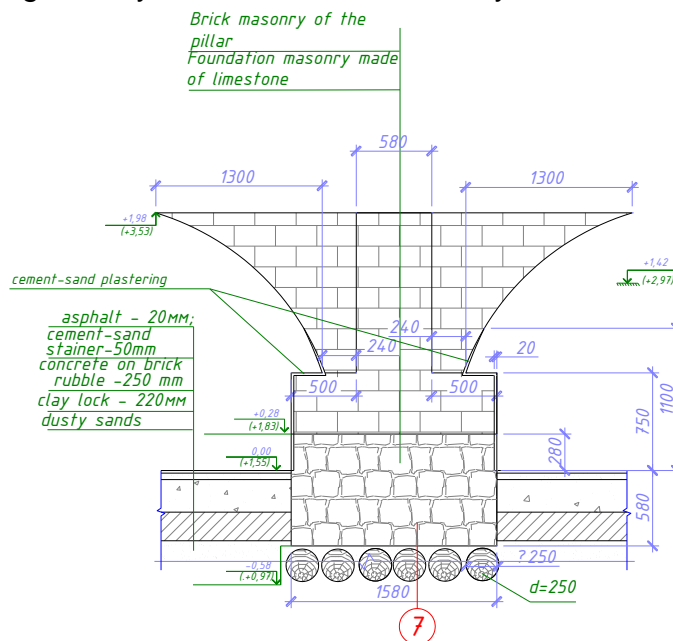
Kamennooostrovskiy Palace. Saint-Petersburg. The foundation of the internal brick column. Wooden pine-tree logs  $d=150$  mm. under the foundation footing. Clay lock in height 220 mm in the floor structure
